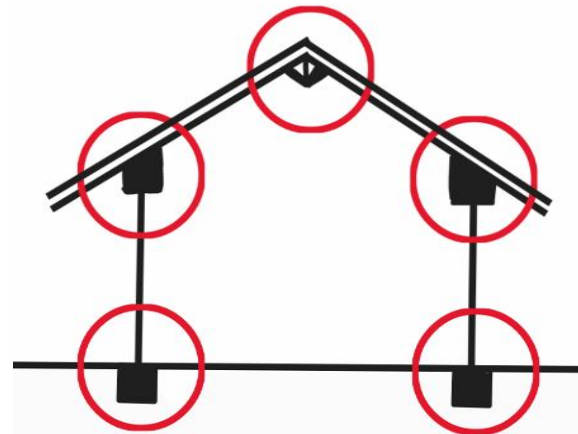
Foundation, walls and roof structure must be firmly fixed (Source: Authors).
